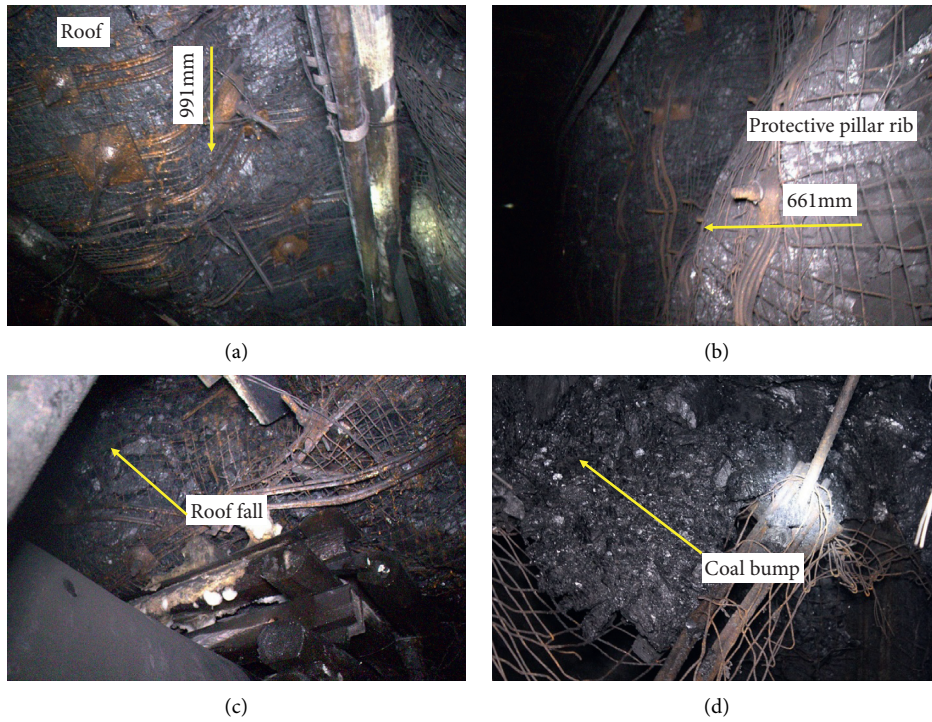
Failure characteristics of 8102 headgate. (a) Roof sagging. (b) Protective pillar bulging. (c) Roof fall. (d) Coal bump.
